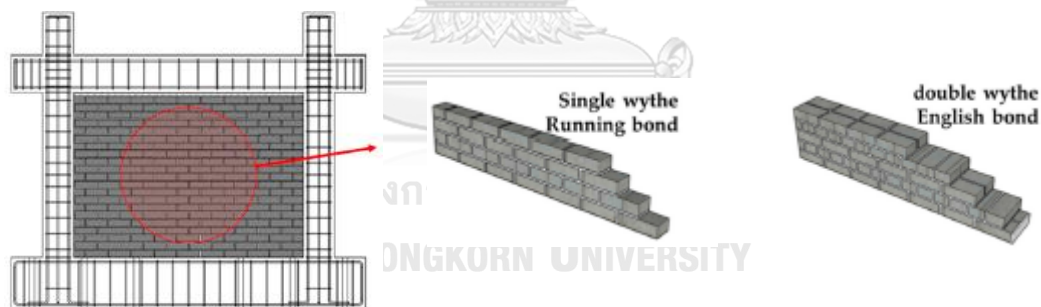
Details of a test specimen Kim & Yu (2021)
